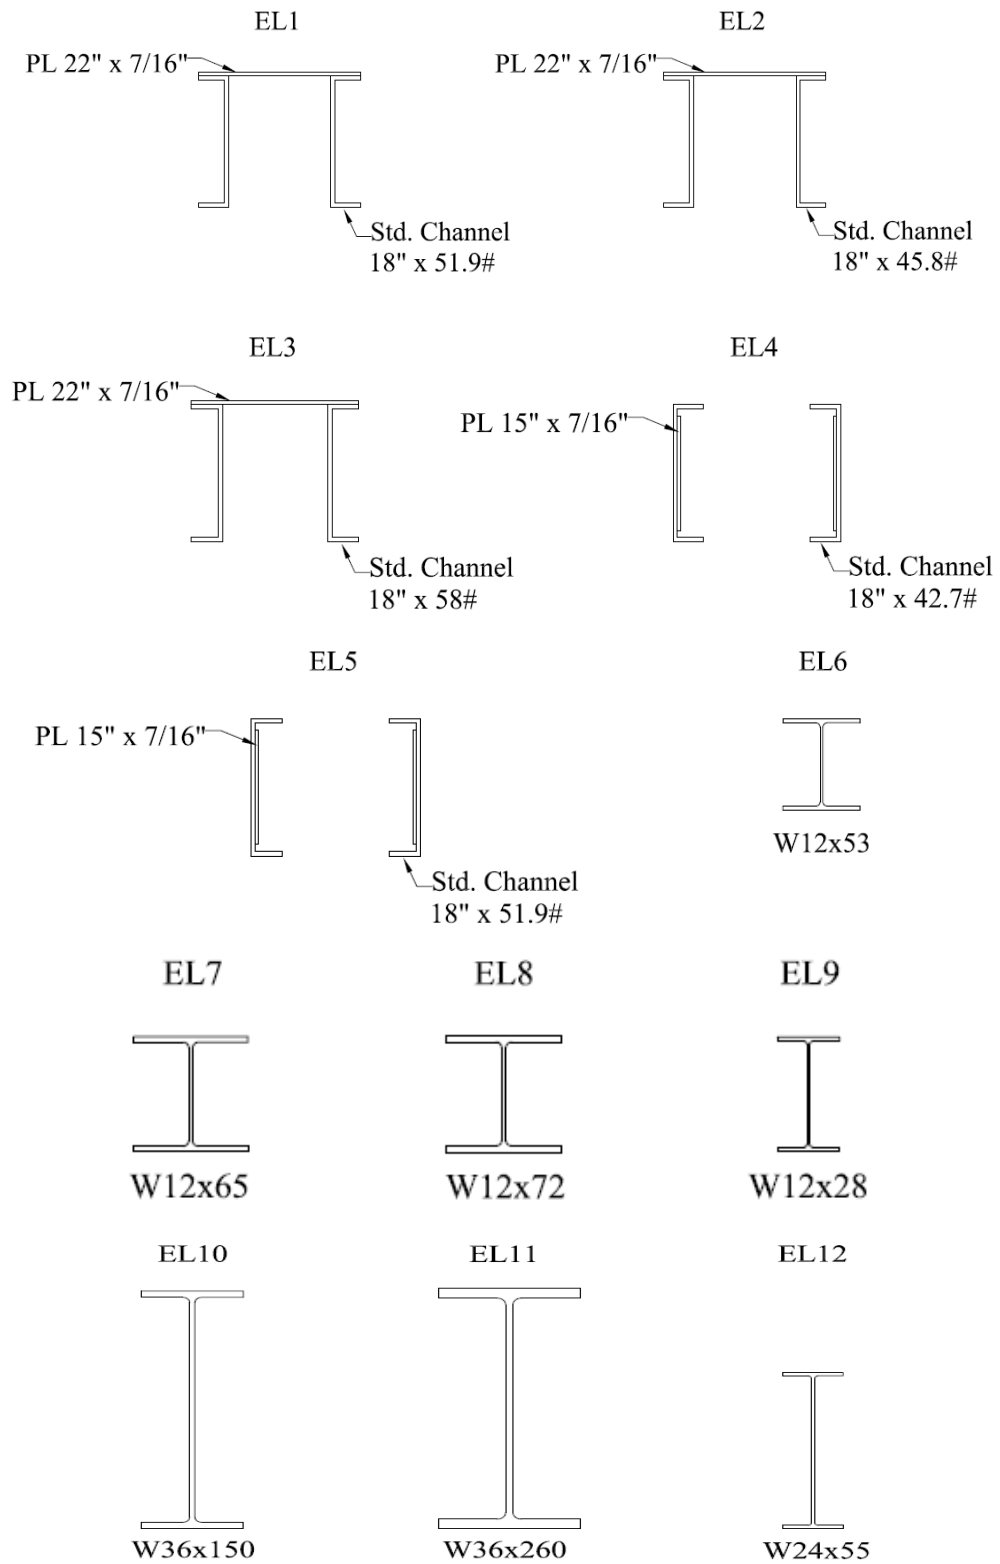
Member Cross Sections, Beech Creek Veterans Memorial Bridge
